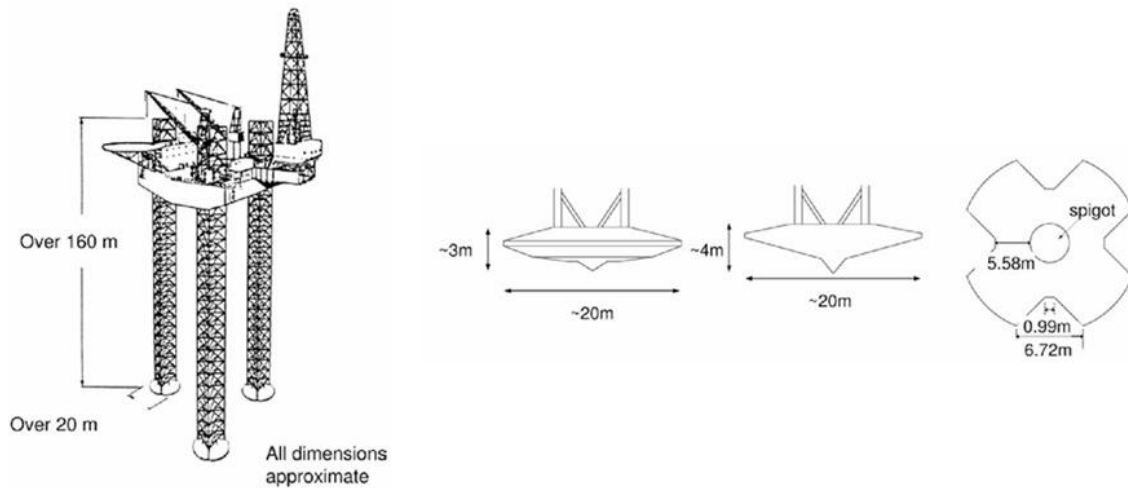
Typical jack-up platform with corresponding spudcan foundations (Randolph & Gourvenec, 2011)
